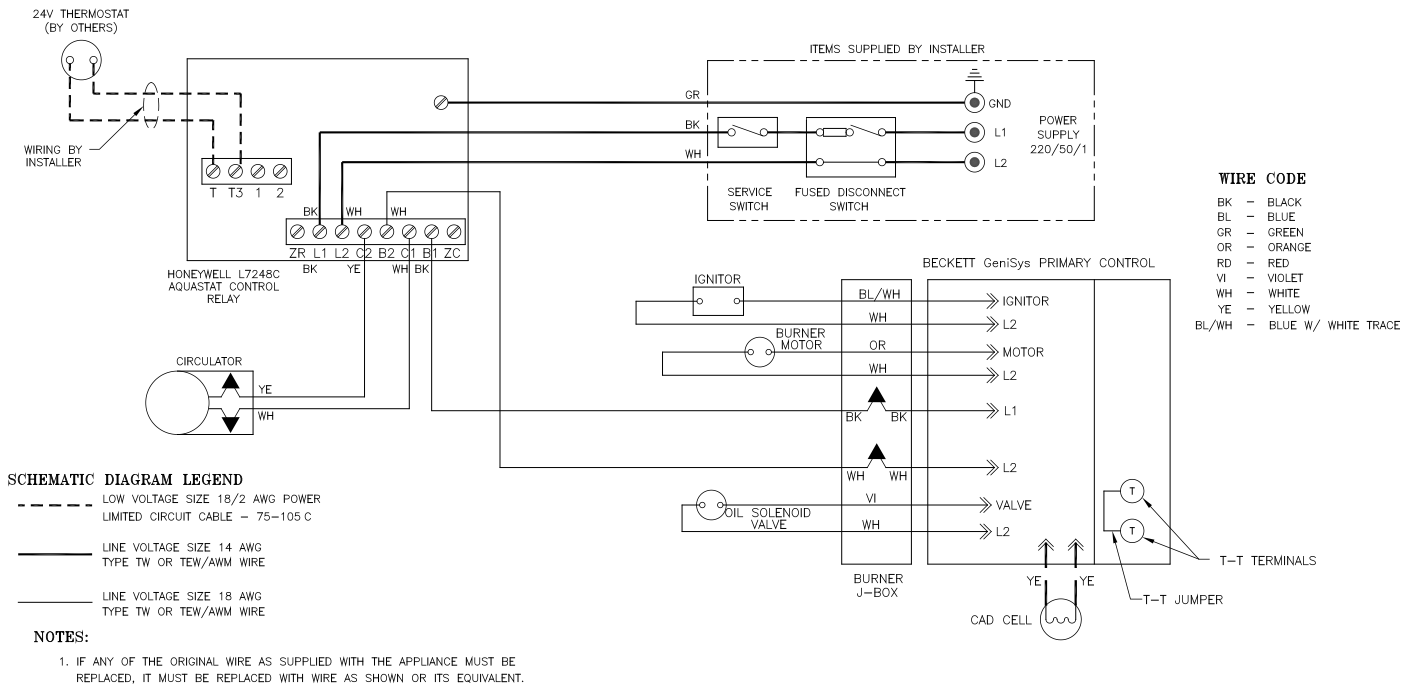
AP-U Boiler Wiring with Tankless, Single Circulator w/Beckett Burner
